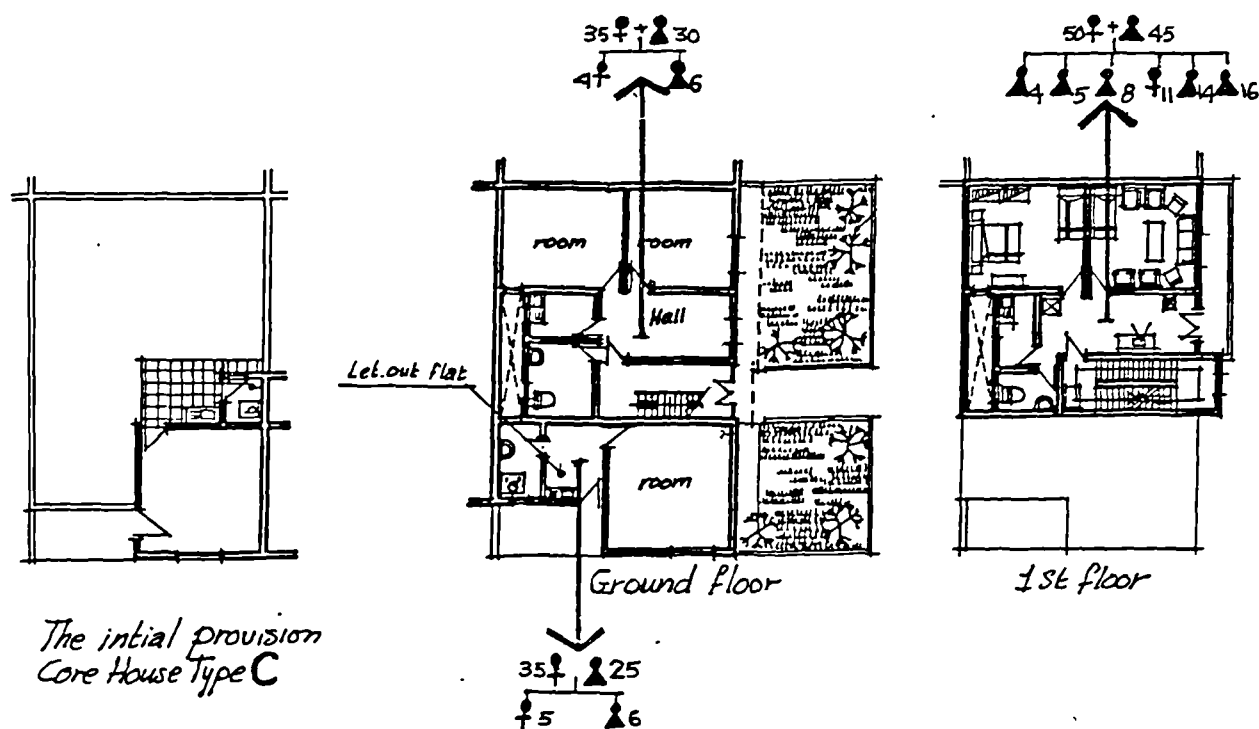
An example of Group B. More than 6 rooms with independent access and facilities.
